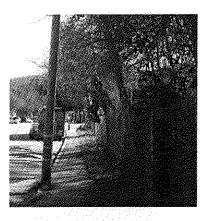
Typical existing wooden streetlight pole adjacent to sidewalk on Gushee Street.
